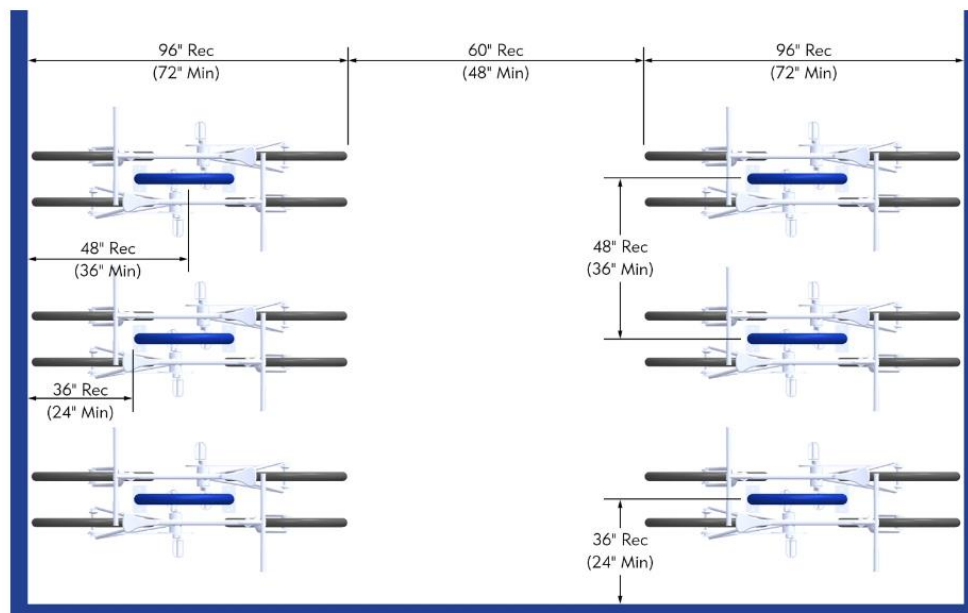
Bike Parking Lot Layout with Minimum and Recommended Dimensions (Bike Parking Guide ).
